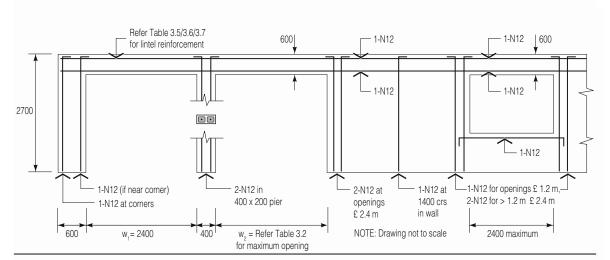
Wall Reinforcement for 190-mm Leaf for Wind Classifications N5 and C2 and 2700-mm Wall Height
